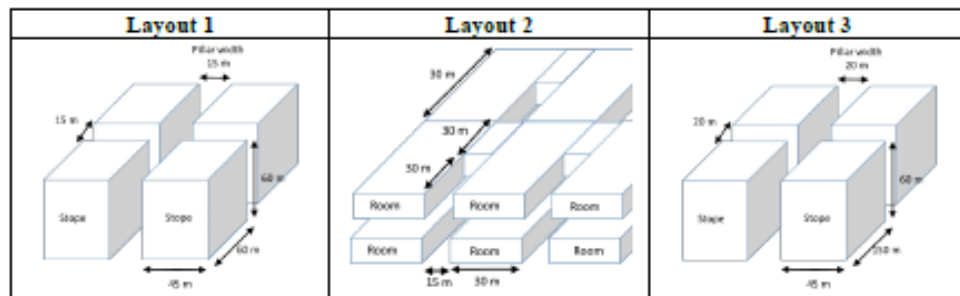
Mining Layouts Analysed by SINTEF for Geotechnical Stability
